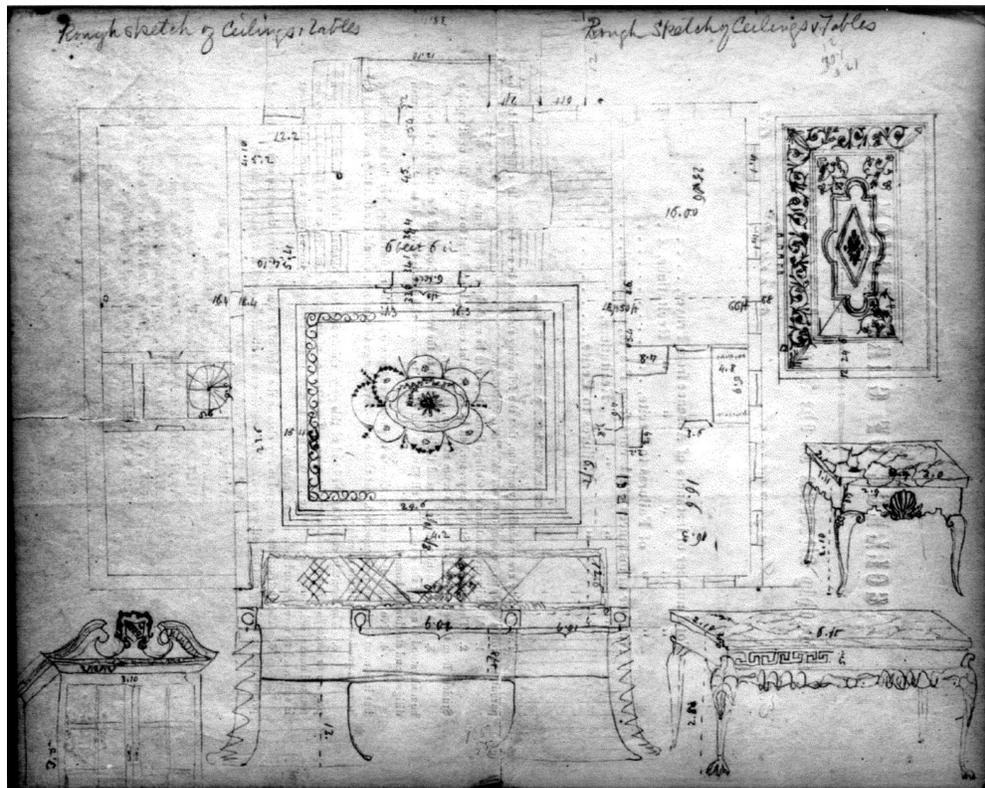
Great Hall ceiling (center design) from Louis Reeve Gibbes sketchbook, ca.1845.
